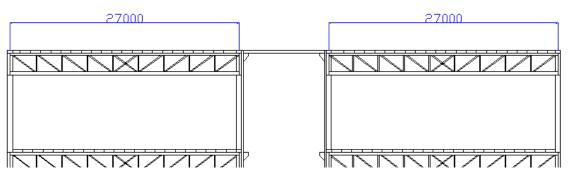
Cross-section of theatre 4 and 6 along line B of figure 10.3.
